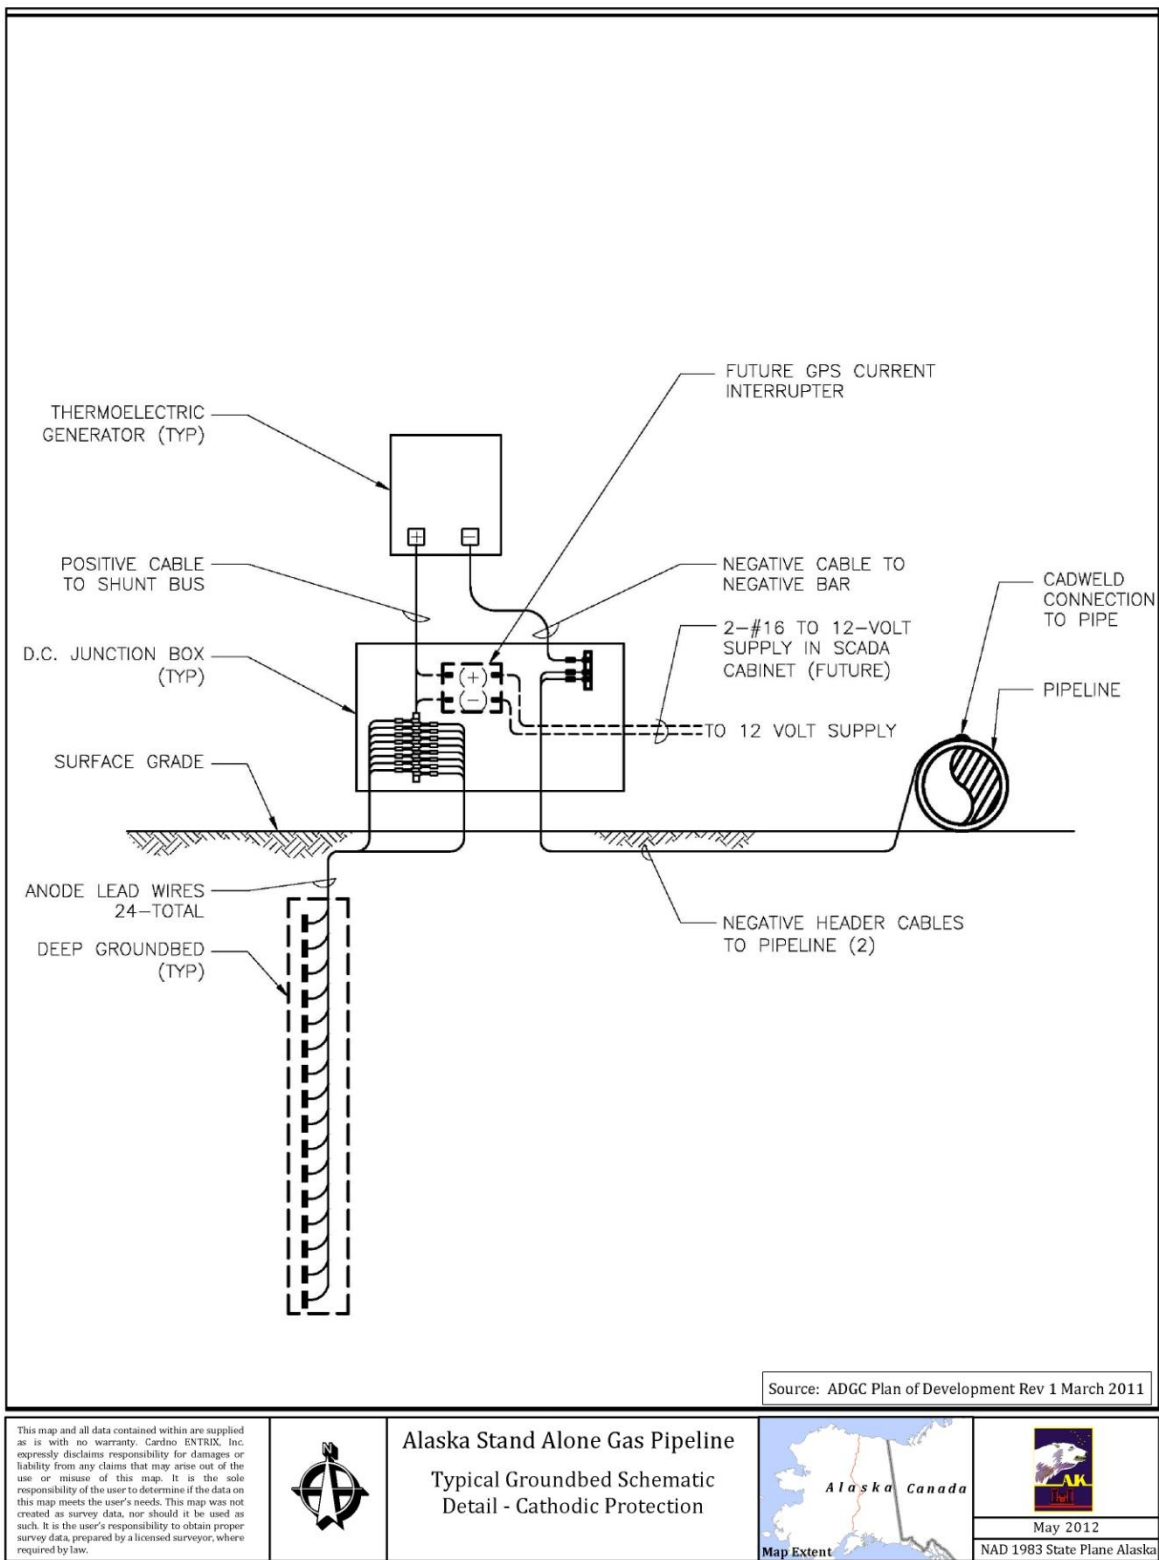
Typical Groundbed Schematic Detail
